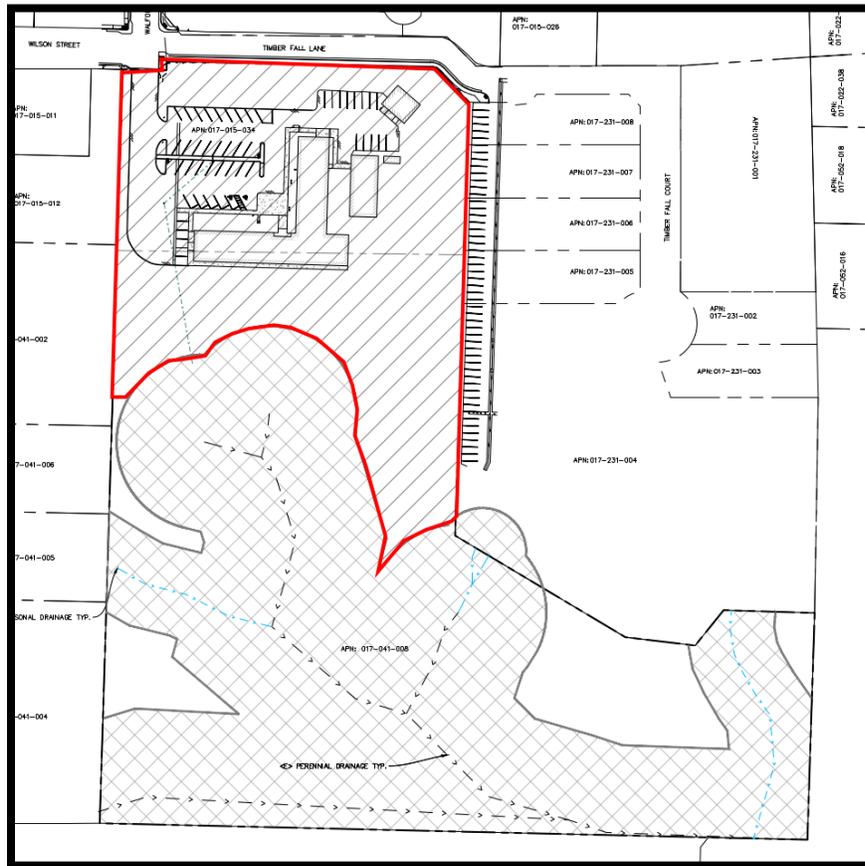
Potential Developable Area outlined in red (Source: Appendix 1A - Site Plans, Sheet C2)
